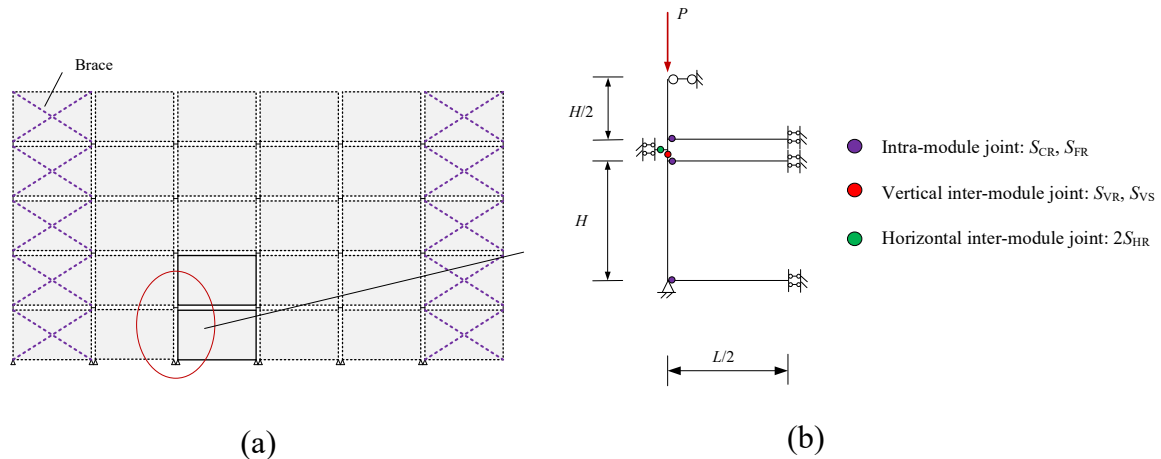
(a) Reference substructure in a braced steel MiC frame; (b) details of the substructure and joint modelling.
